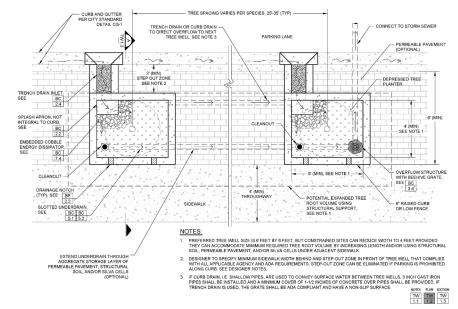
Example Sustainable Street Detail: Connected Stormwater Tree Wells
